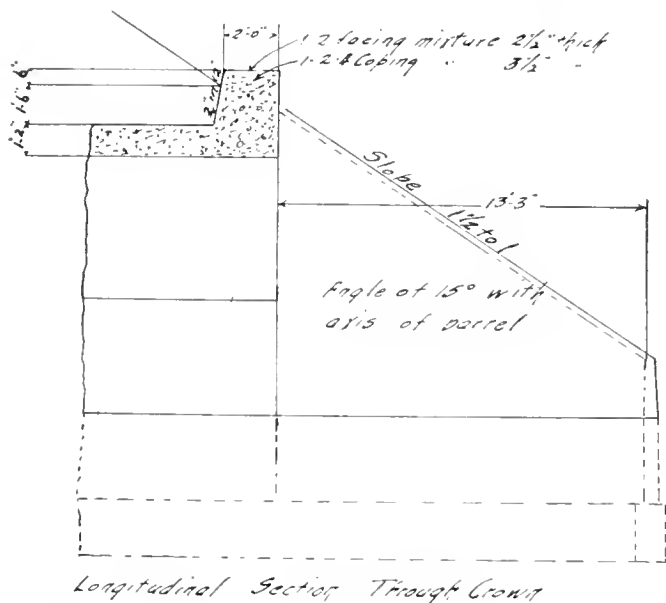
Standard (N. T. Ry.) Semi-circular Arch, 6-Foot Span.
